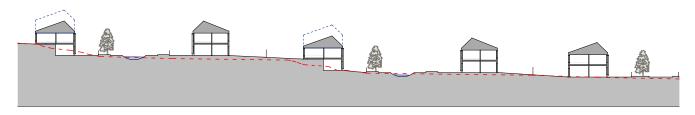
Section through terraced plots and swales (existing site in red). Collective Architecture, 2010. Not to scale. COWLAIRS URBAN VILLAGE
